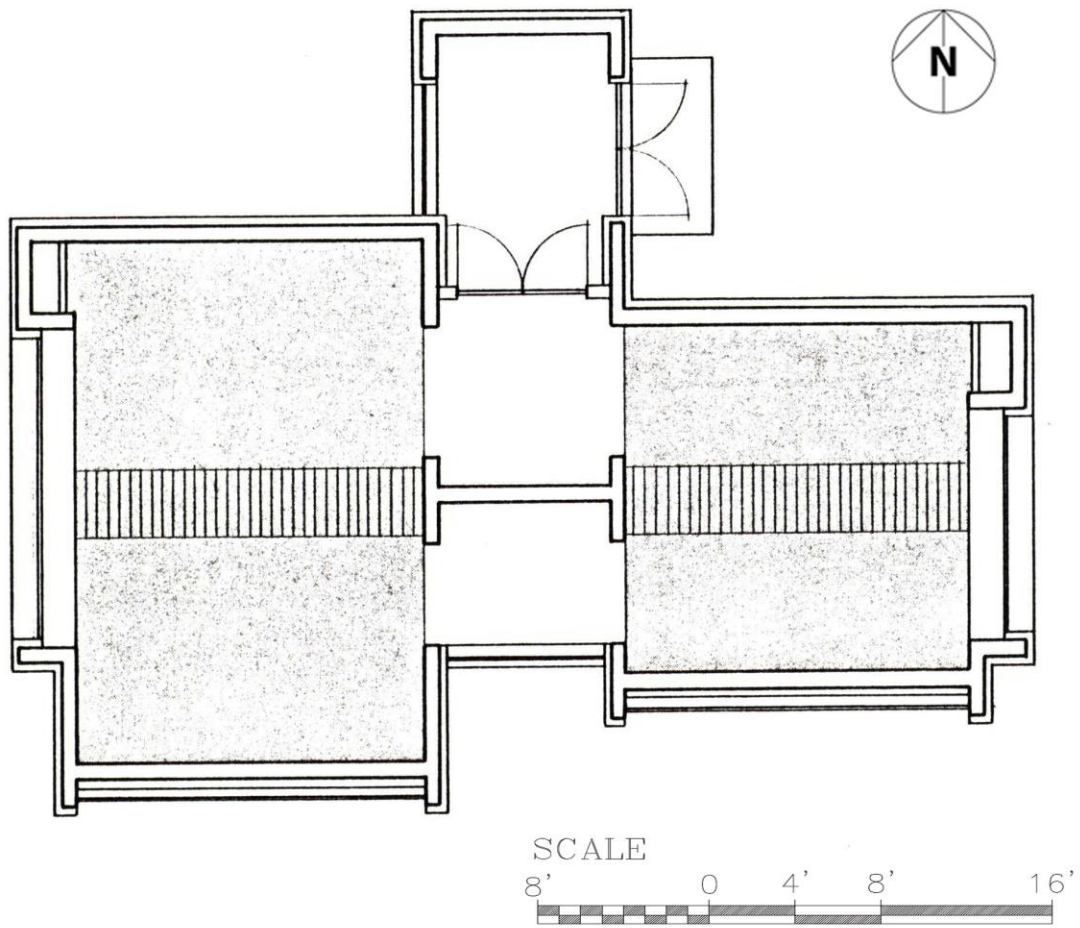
Solar CM House Plan (Riley & Schubert, 1985)
